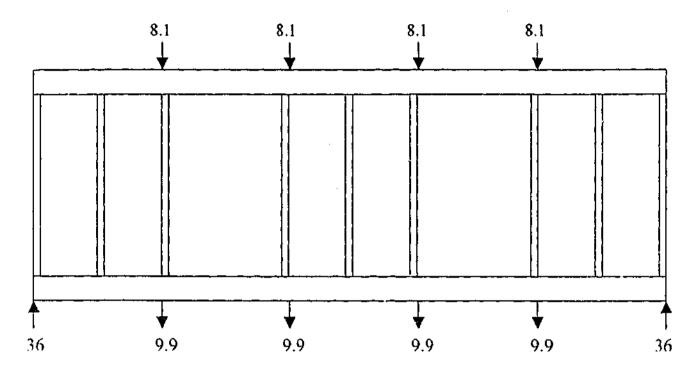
Design Loading for Experimental Wall Beam ($Q_F^* kN$)
